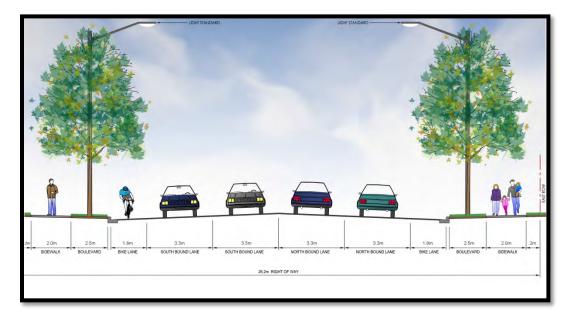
Dominion Boulevard Northwood Street to Ojibway Street Cross Section
